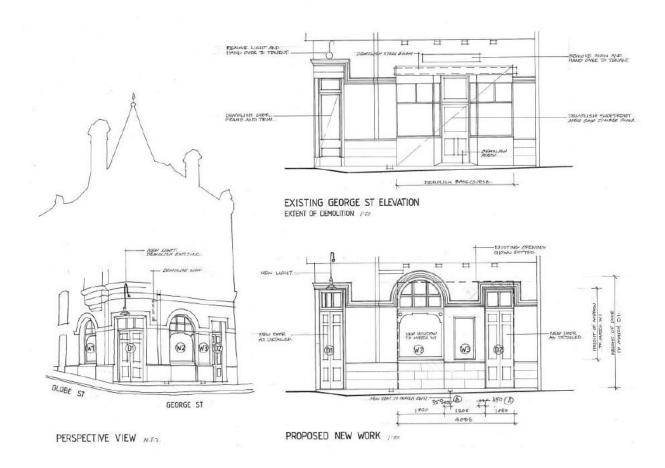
Drawings showing extent of reconstruction works to the George Street façade and corner entrance of The Russell Hotel by the Sydney Cove Redevelopment Authority, 1985. Source: PMNSW, Drawing ROX-410-AR-0054-OD – detail.
